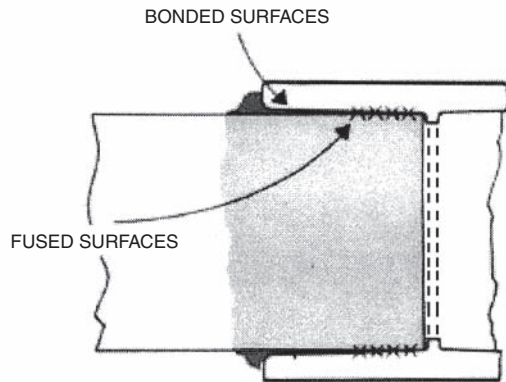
D: Completed solvent cement joint. Note bonded and fused surfaces. Courtesy NIBCO, Inc.
